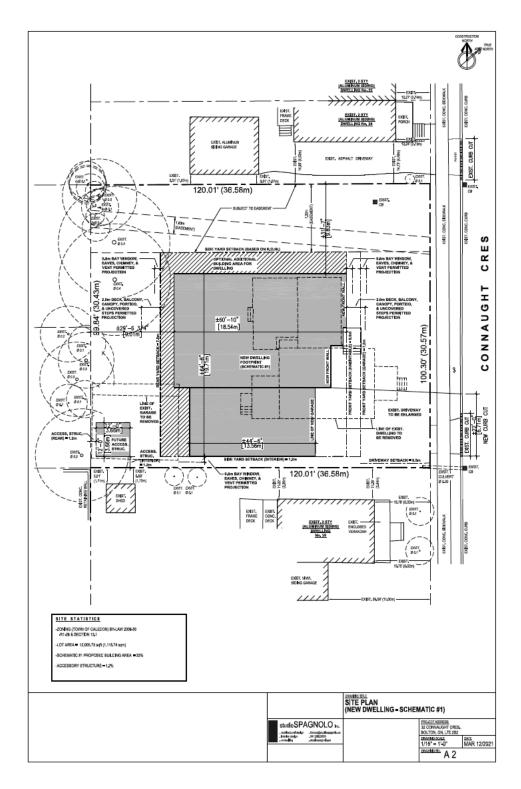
Proposed concept site plan, option 1. Provided by Studio Spagnolo Inc.
